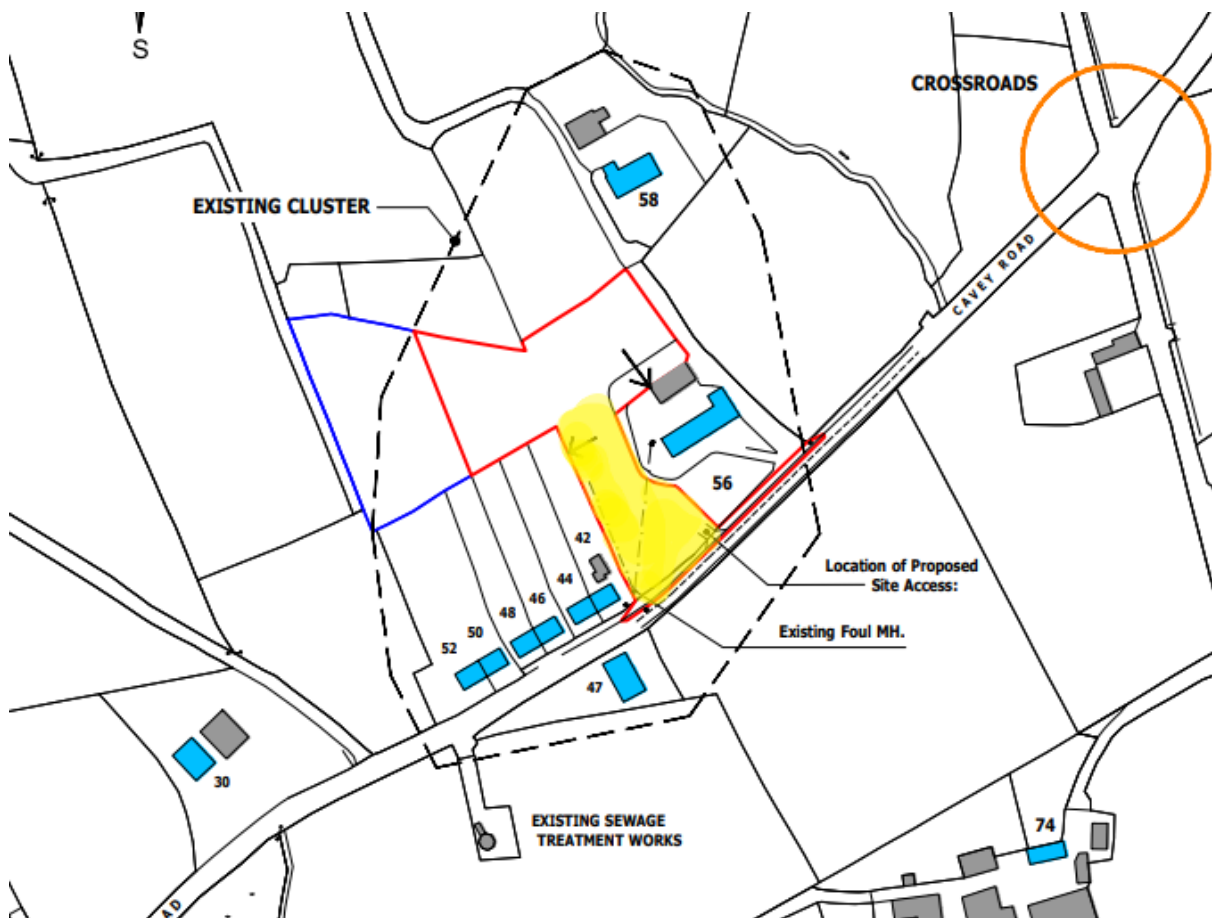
The site location plan above shows the area shaded yellow referred to in conditions 7 & 8.
